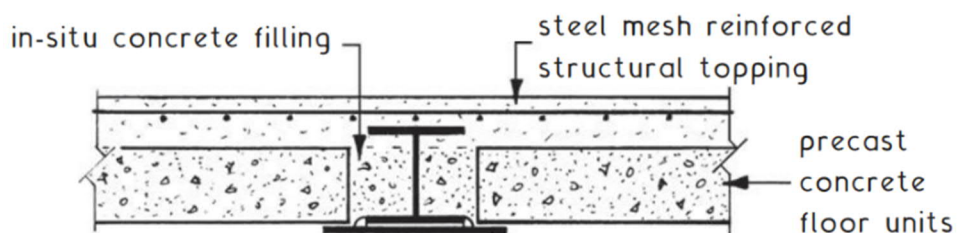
Precast floor structure (Chudley & Greeno, 2014, p. 792)
